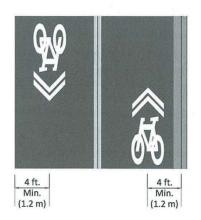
Typical Shared-Lane Marking Cross Section on Street with No On-Street Parking
